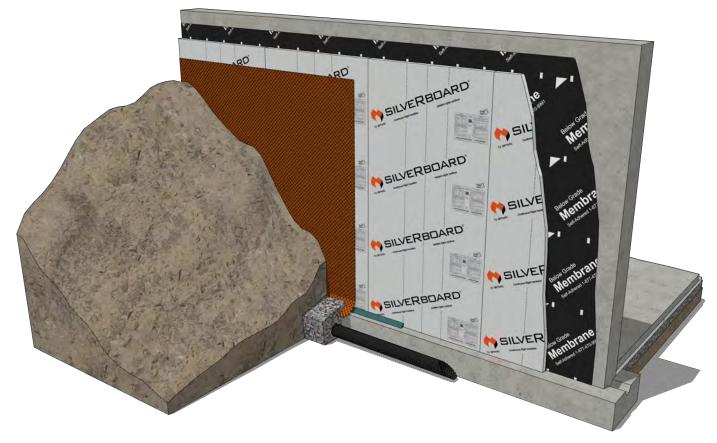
2'' (51mm) high density SilveRboard installed on the exterior of waterproofing membrane
